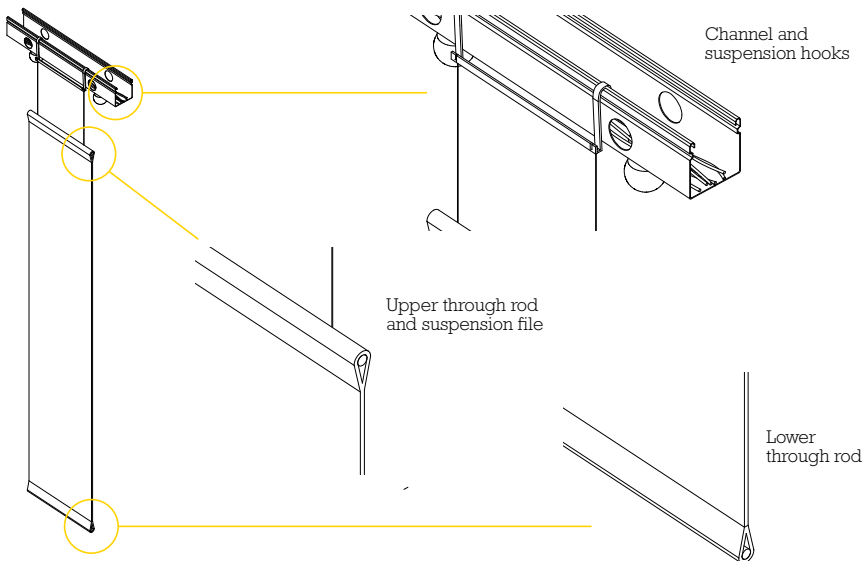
Construction detail - Single display element and hanging systems | Axonometric views.
